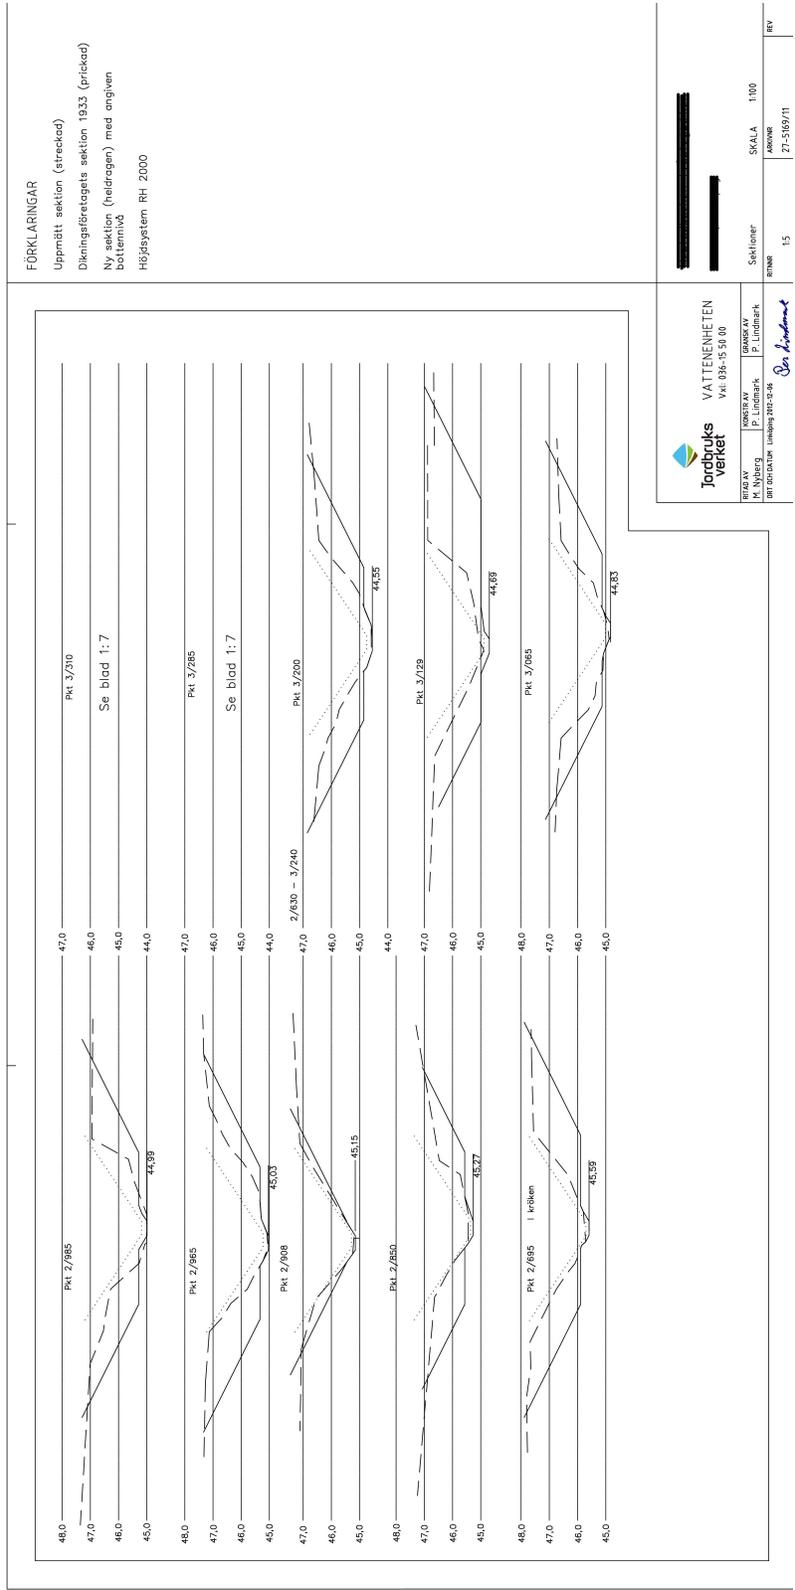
Plan 1.5 for cross sections of reference two-stage ditch for planned construction, by Jordbruksverket (2012)
